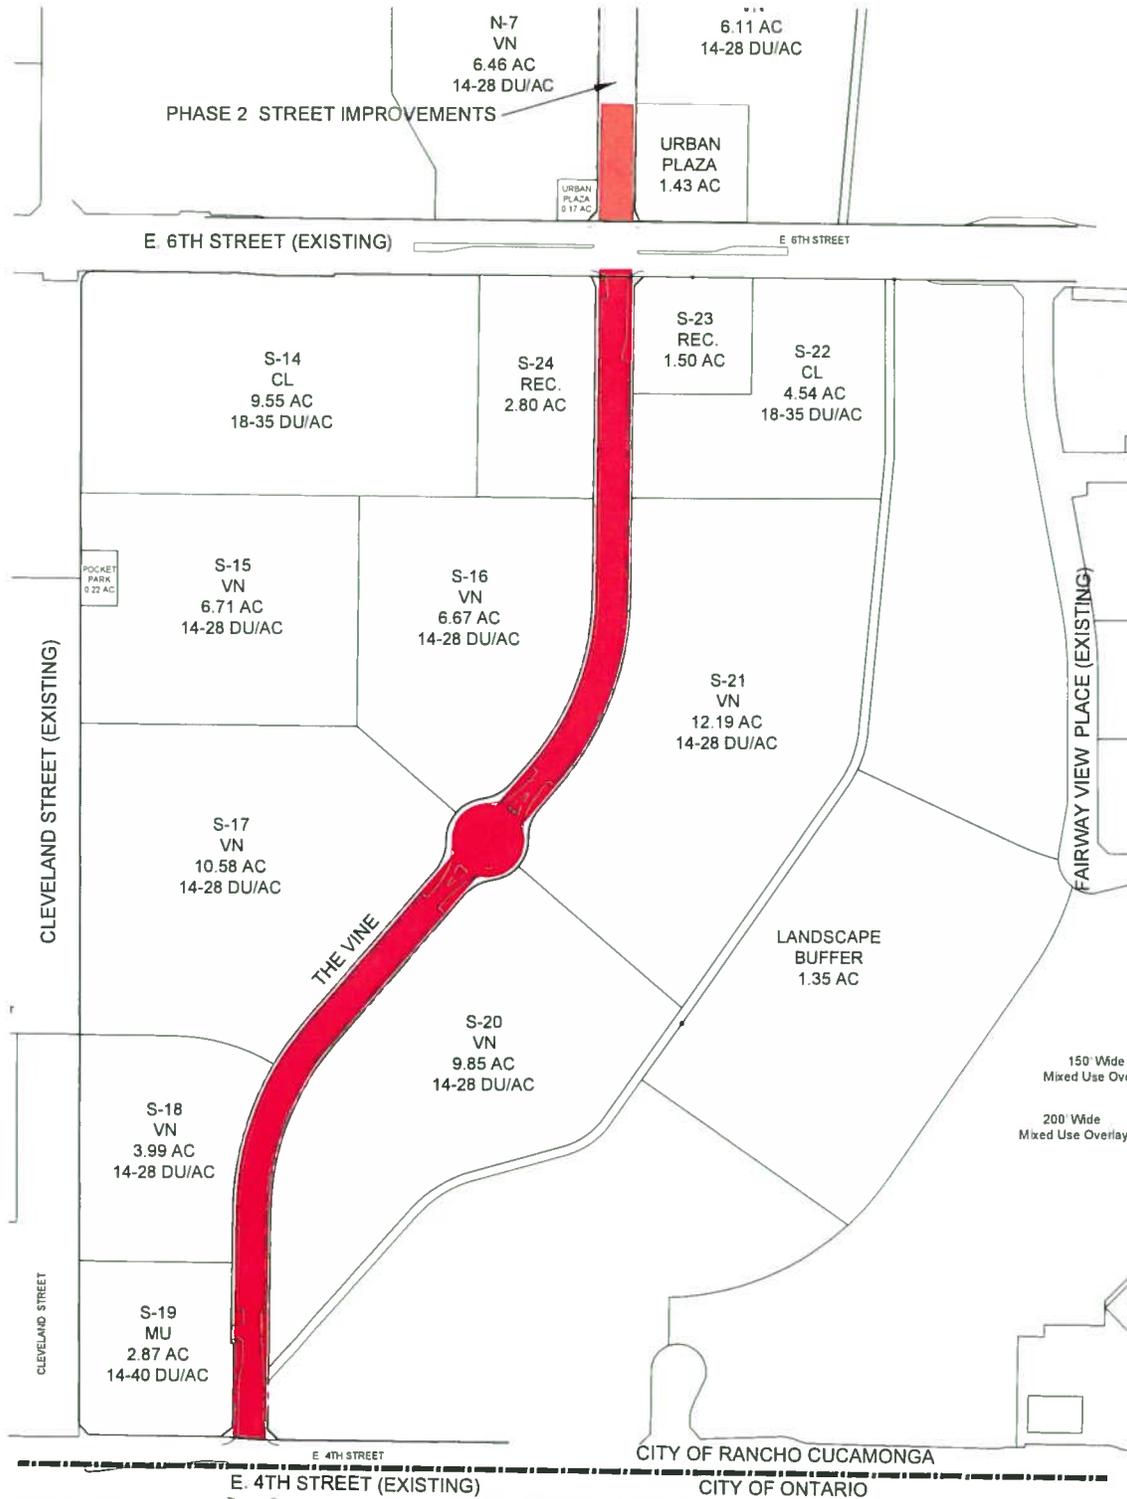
Conceptual Phase 1 Street Improvement Facilities Plan
